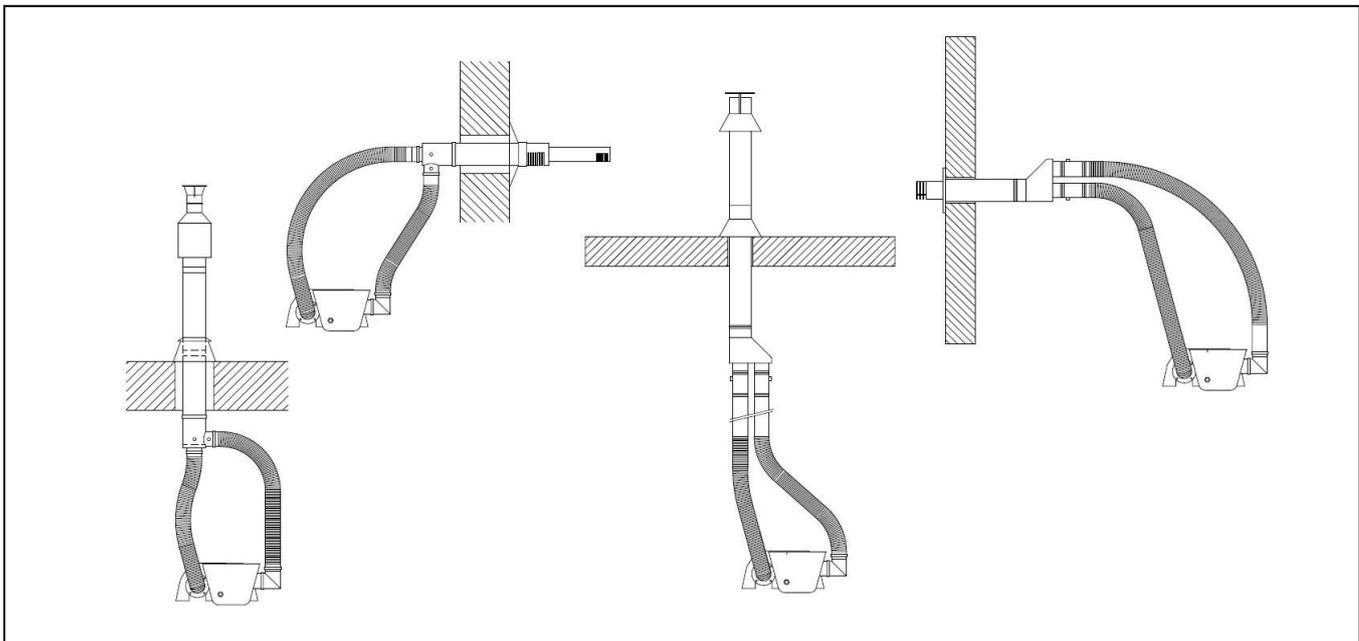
Air/exhaust--system, version aluminium or stainless steel
